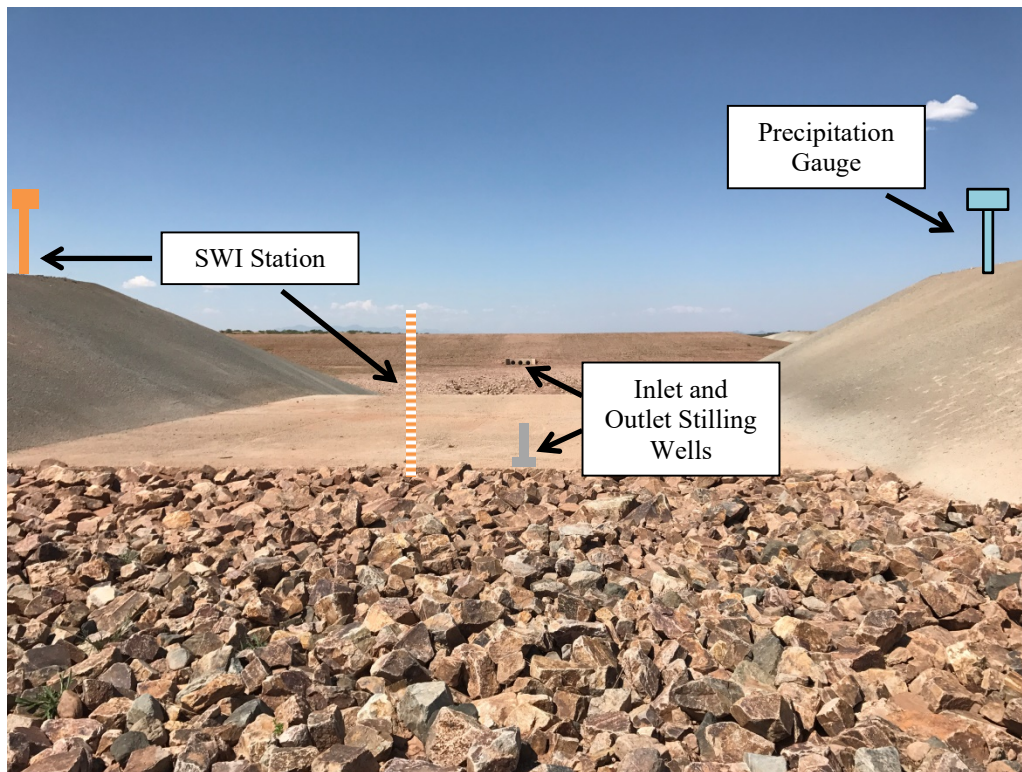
Proposed inlet and outlet monitoring equipment at the Horseshoe Draw structure.
